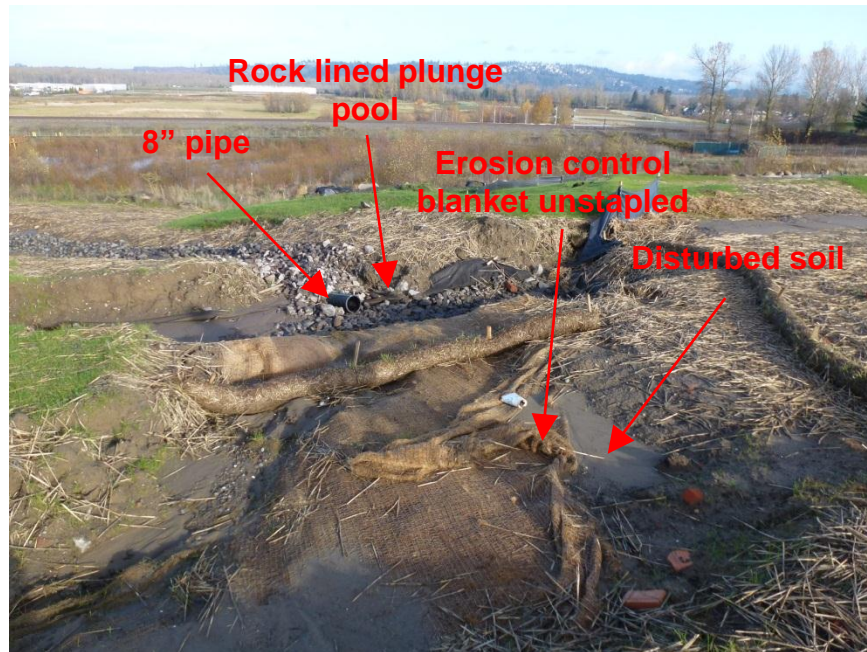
Brookside Residential Development – View facing northwest of disturbed soil beyond the silt fence, without additional control BMPs.
